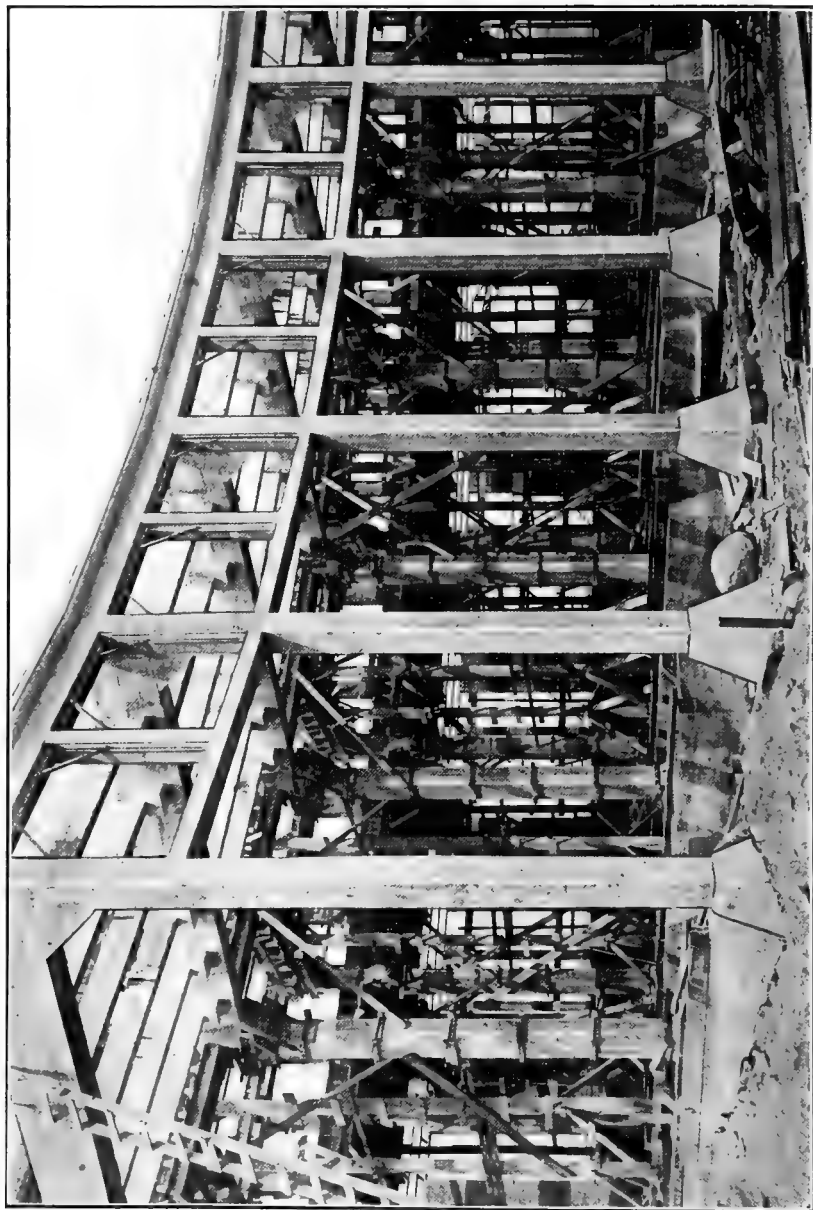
WATERBURY ROUND HOUSE UNDER CONSTRUCTION.
